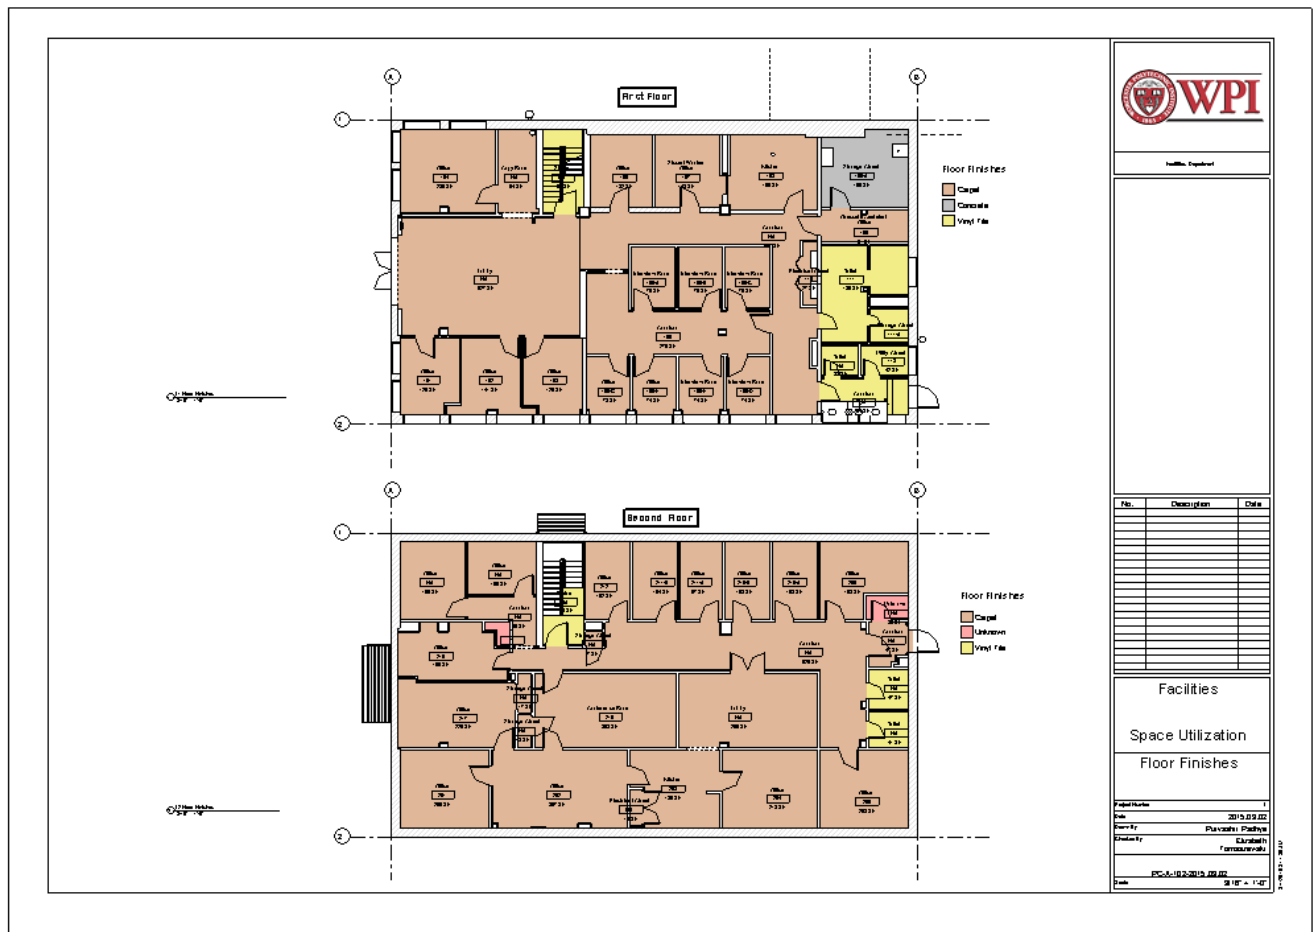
Project Center: Drawing sheet indicating Floor Finishes
